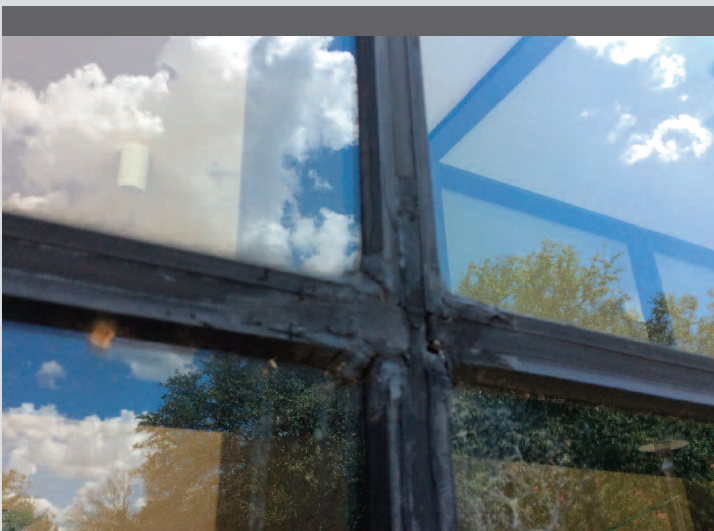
Lock-strip gasket in need of repair. Photo courtesy of Chamberlin Roofing & Waterproofing.
